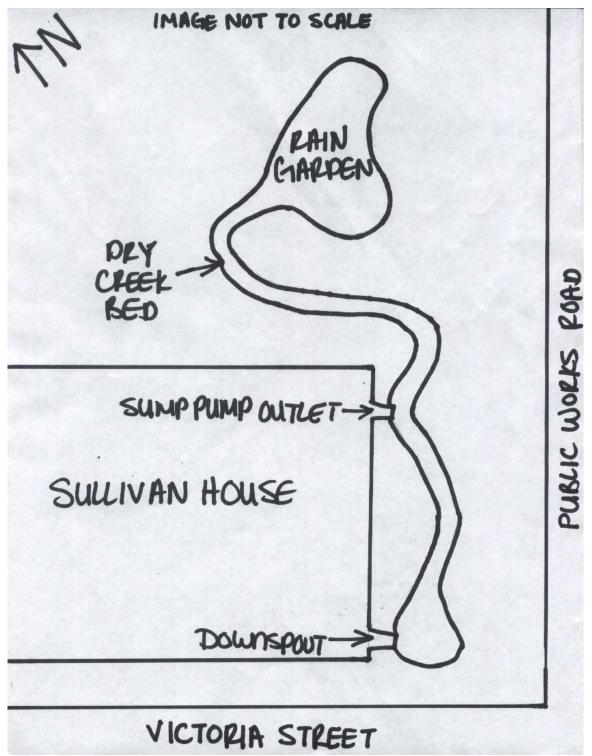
Site plan of Sullivan property after rain garden and dry creek bed were installed.
